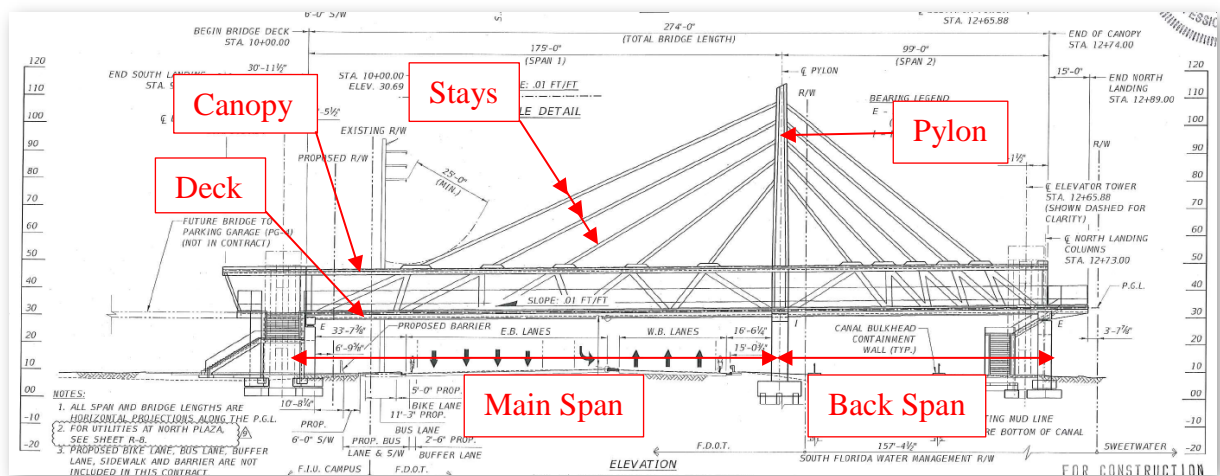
Bridge elevation from RFC General Plan and Elevation – Sheet B-4.³⁶
